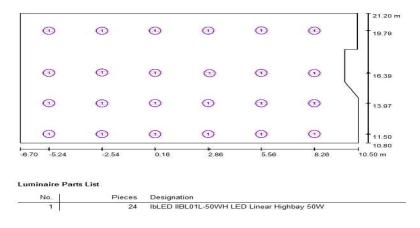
Luminaire Layout of IC Testing and Characterization Workshop
